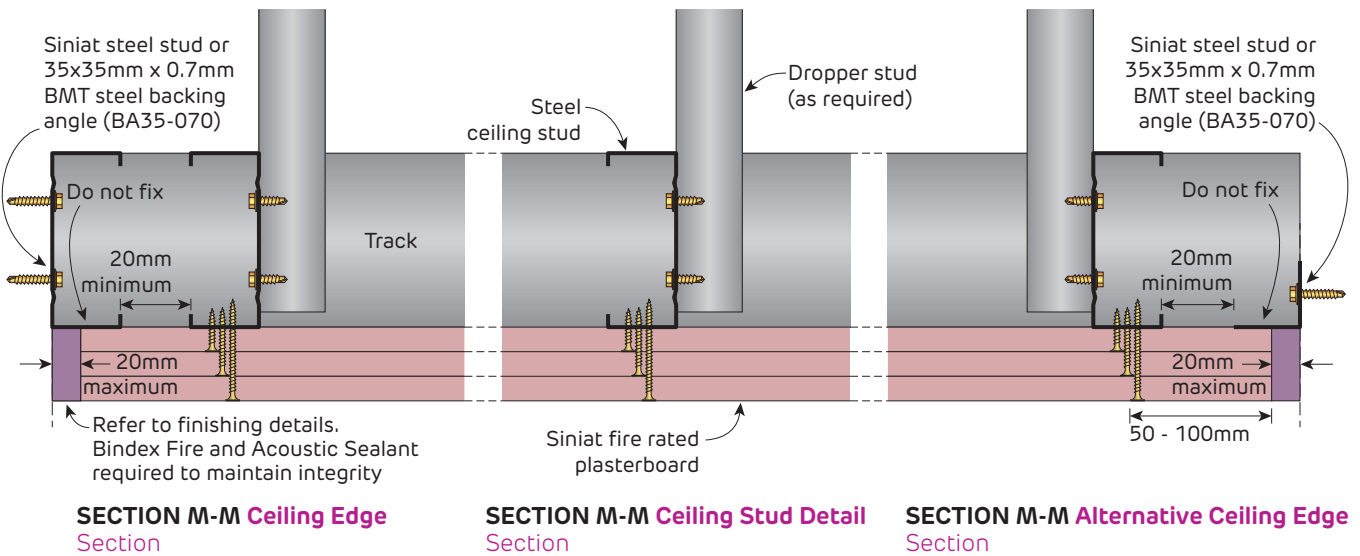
Stud Ceiling Type C1 - 2-way Plenum Braced
